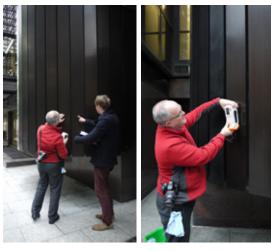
Undertaking testing at 1 Finsbury Avenue, London
